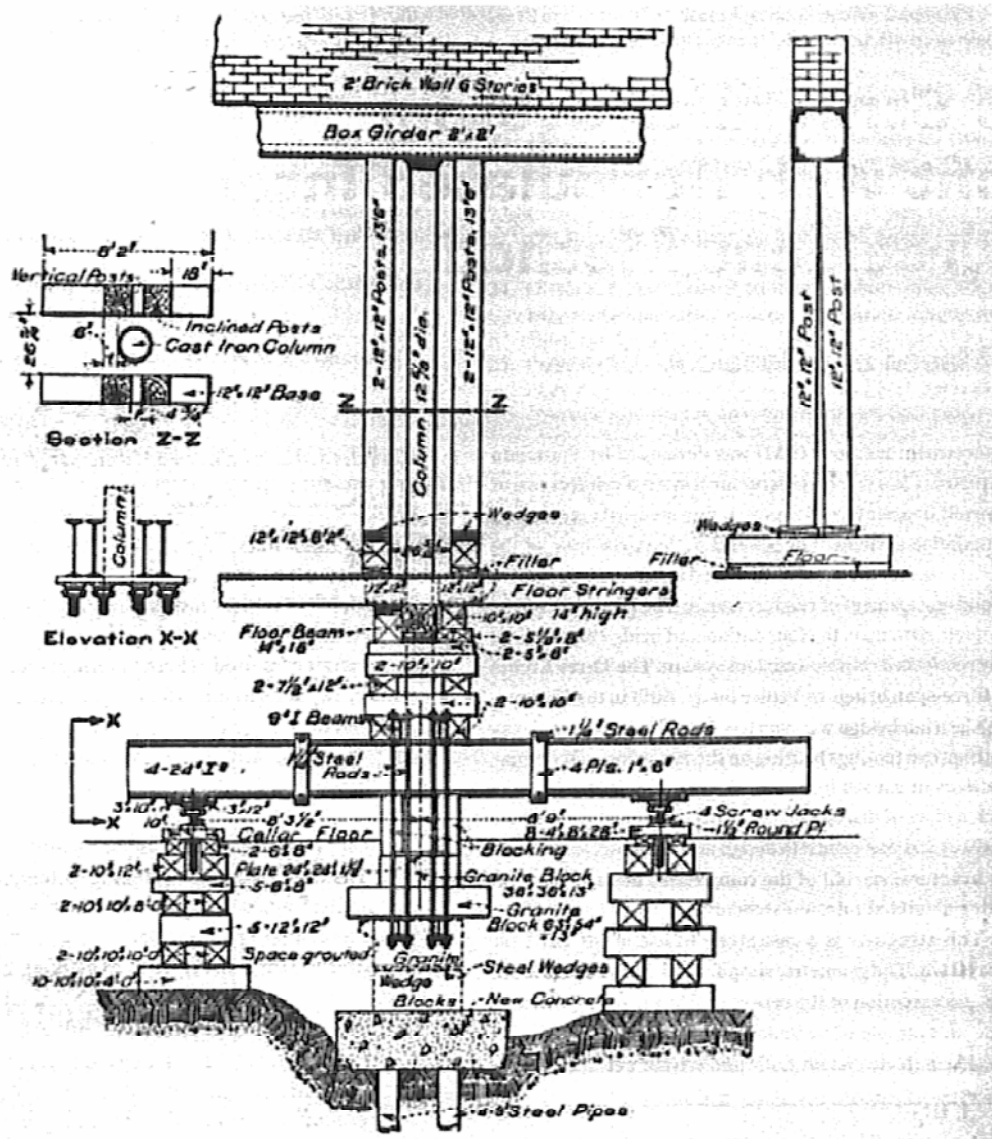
Early 1900s needle-beam underpinning detail (for "300-ton column on quicksand," Sargent Building, New York City) (4).
